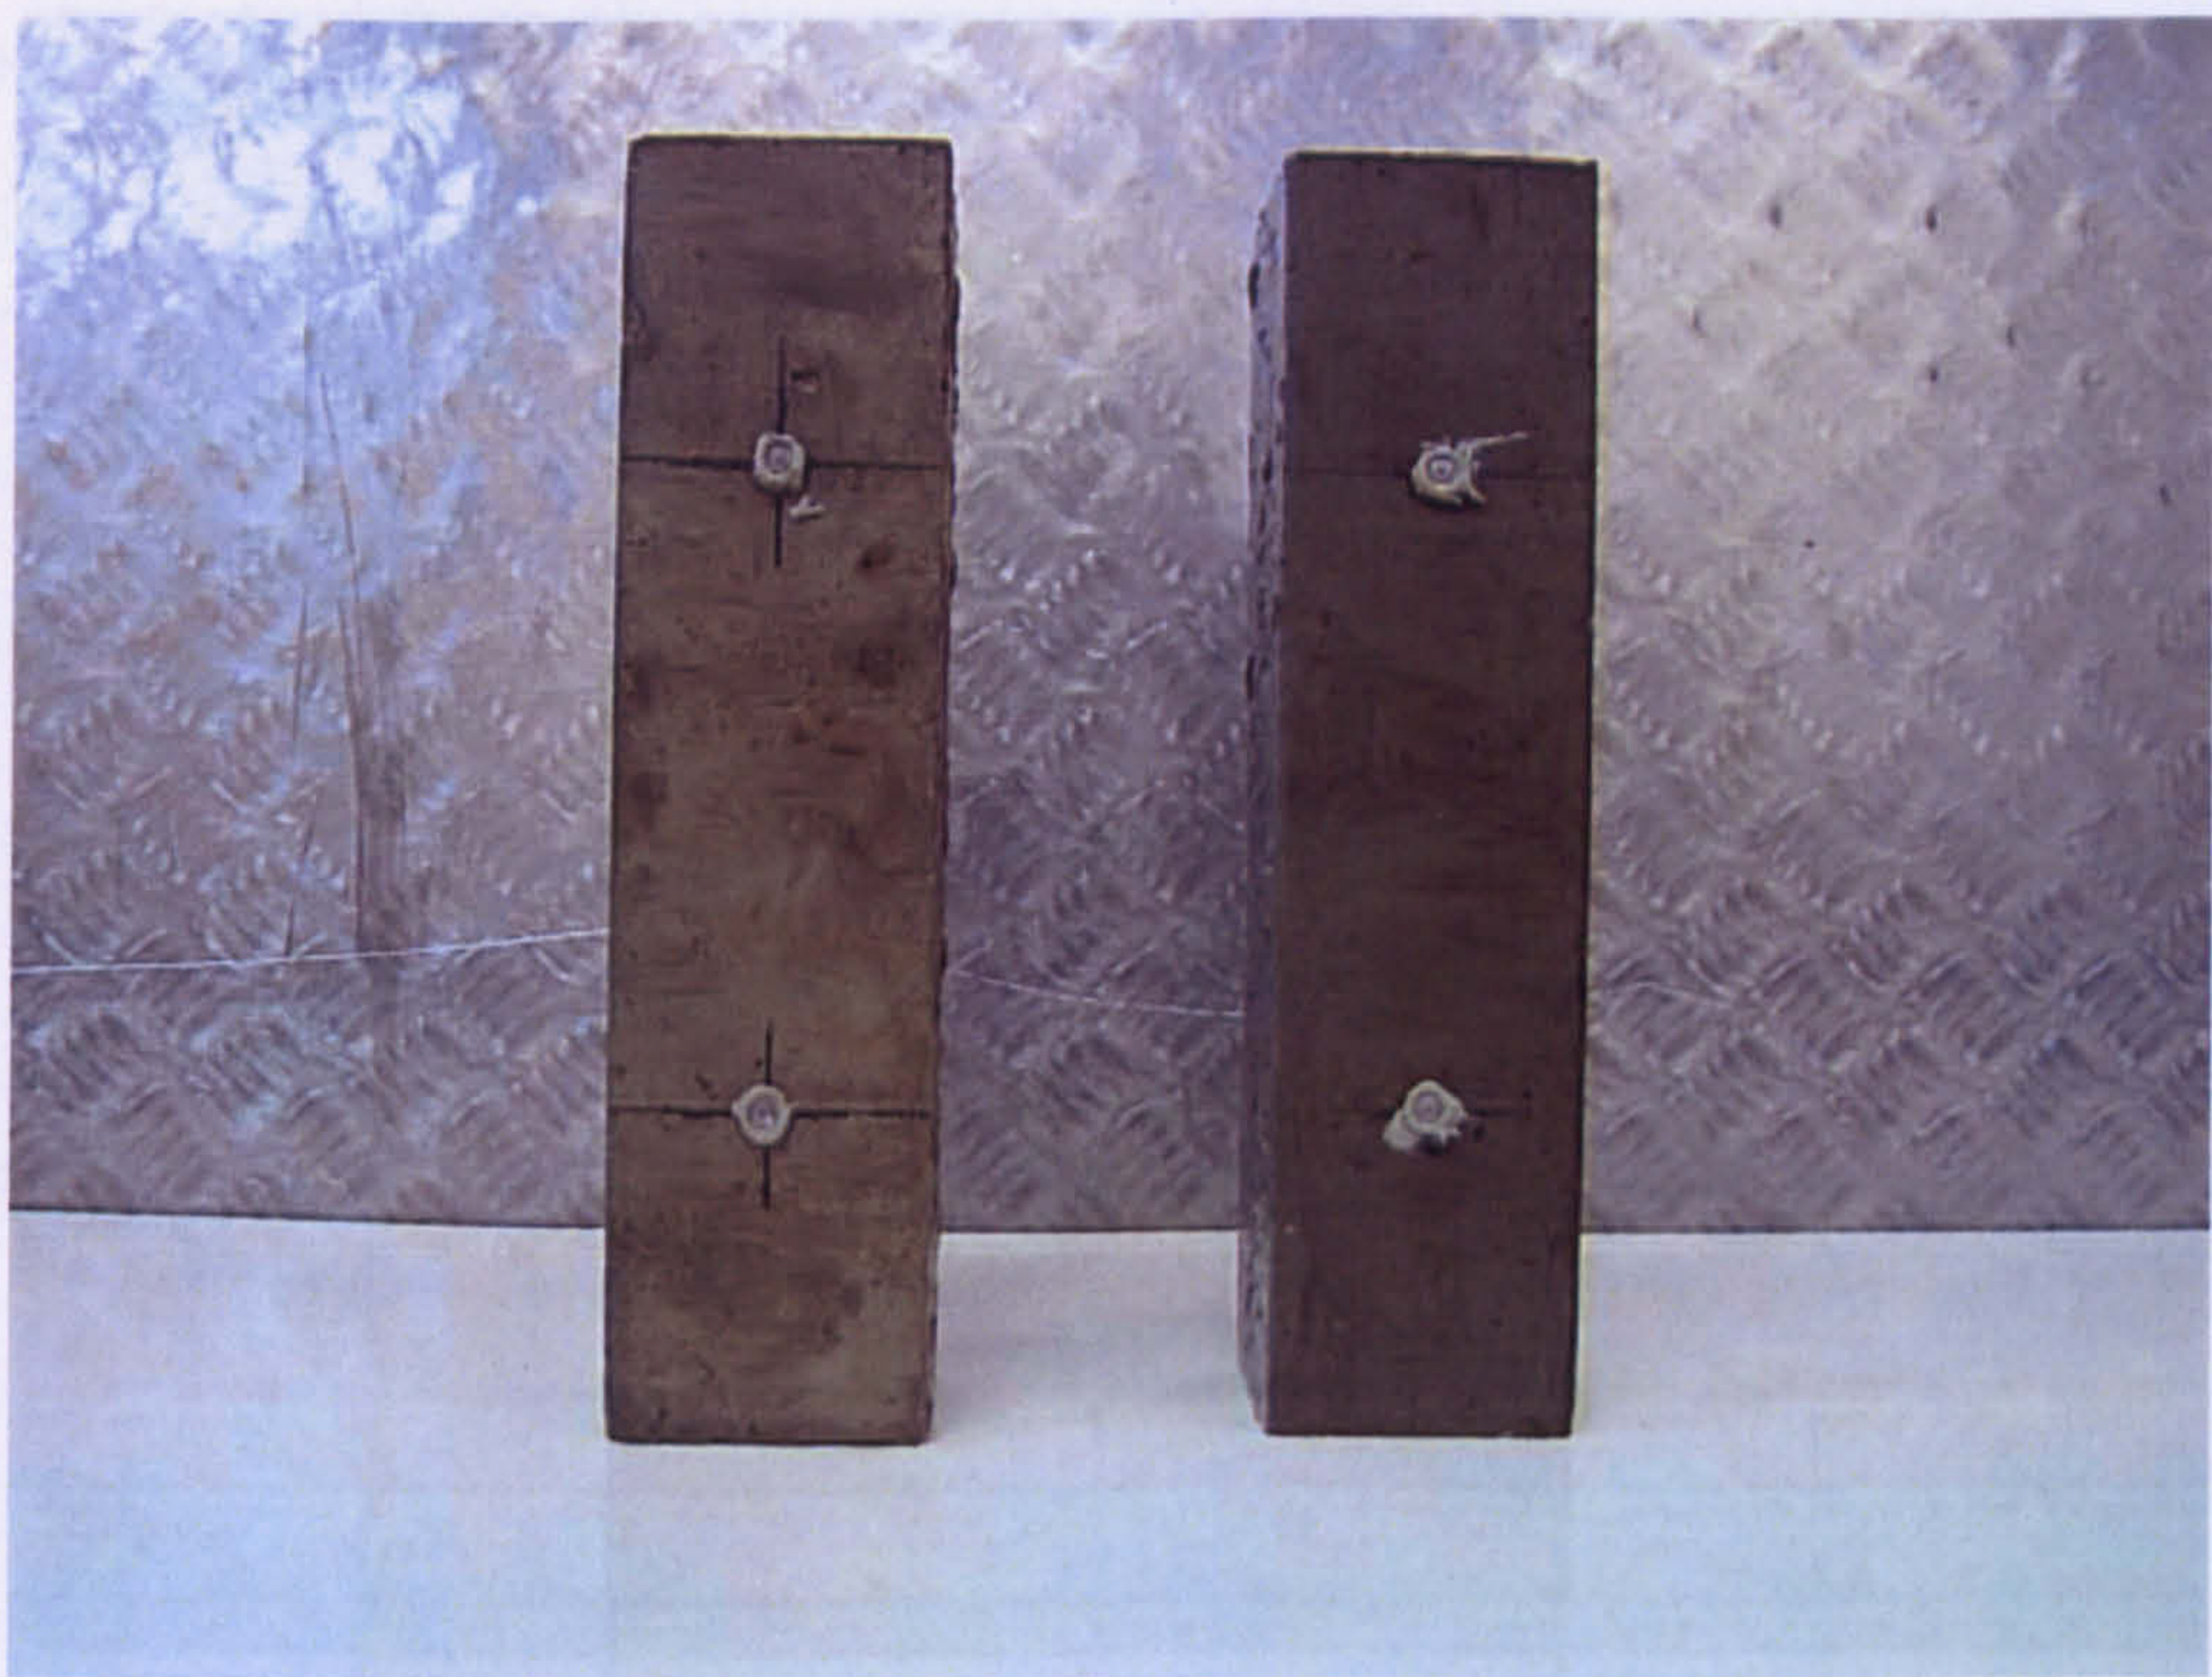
Prism specimens with fixed stainless steel DEMEC points.
